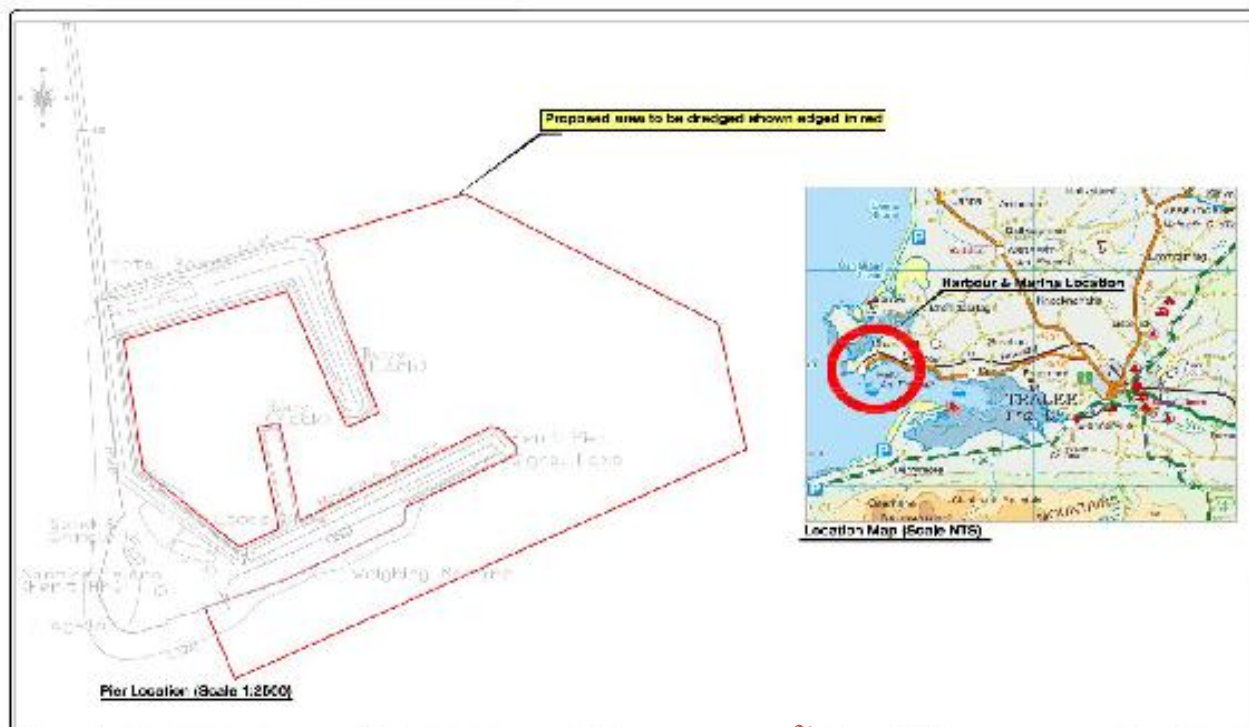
Location of the dredge site and propose dump site, Tralee Bay, Co. Kerry
